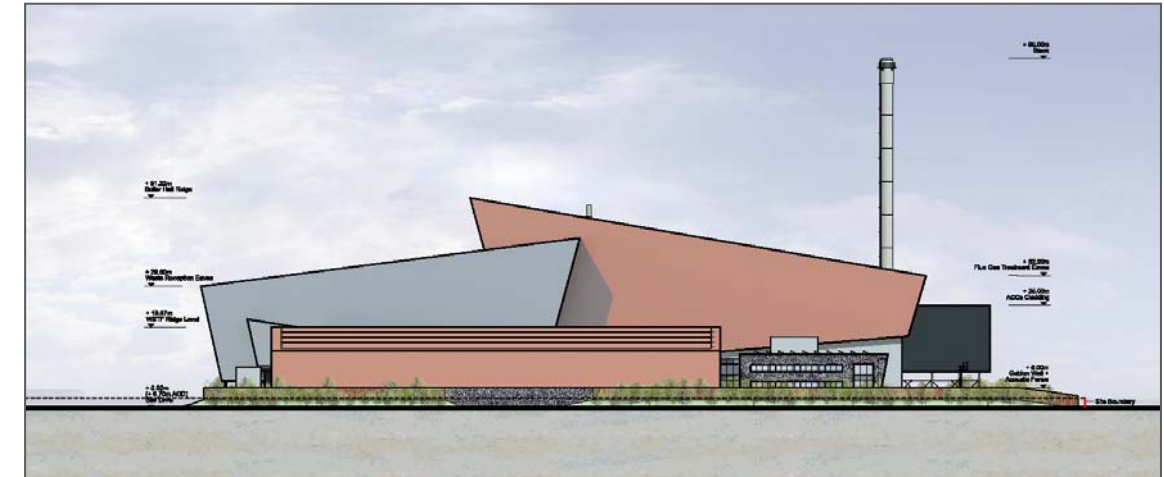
Proposed west site elevation – extract from drawing PL313
